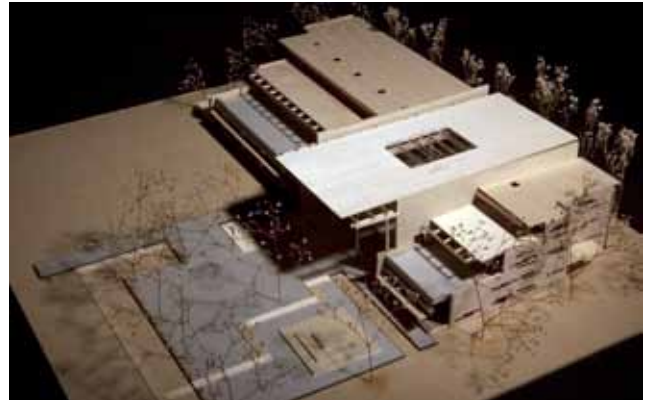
Overhanging roof planes as well as differing sizes of windows can also help shade a building (Anna Liu).
